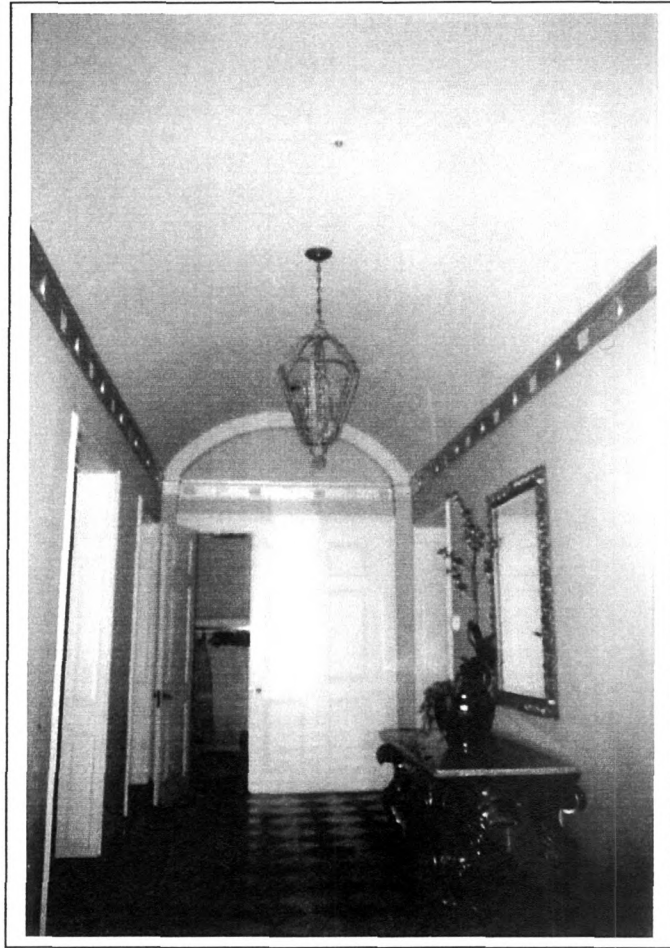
Entrance hall with sprinklers (looking opposite direction). Two sprinkler heads installed in plaster ceiling.
